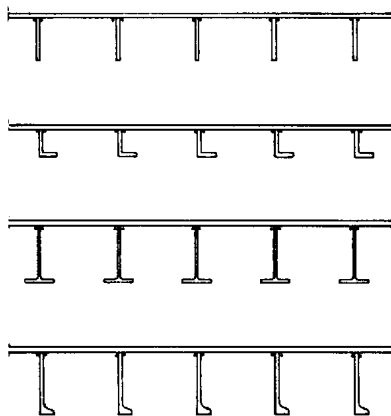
Open profiles for longitudinal stiffeners Figure 1.6 Stringers running through the webs of the cross girders [MAN, 1957].
